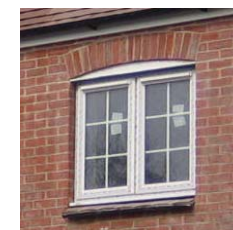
ROOFS, WINDOWS & CHIMNEYS
